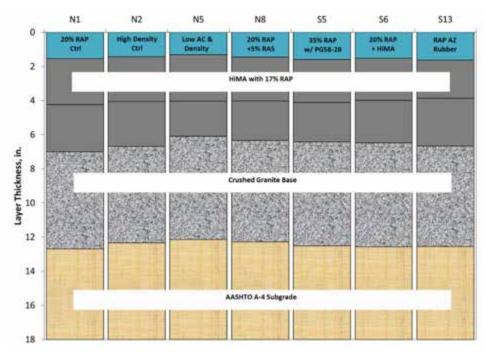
Cross-section of Cracking Group Test Sections on the NCAT Test Track
